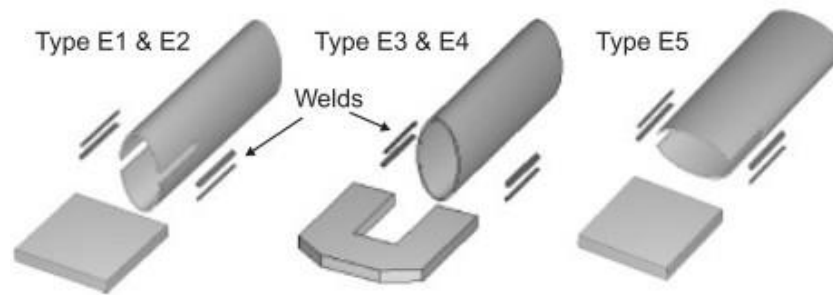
Exploded view of gusset plate end-connections with EHSs [26]
